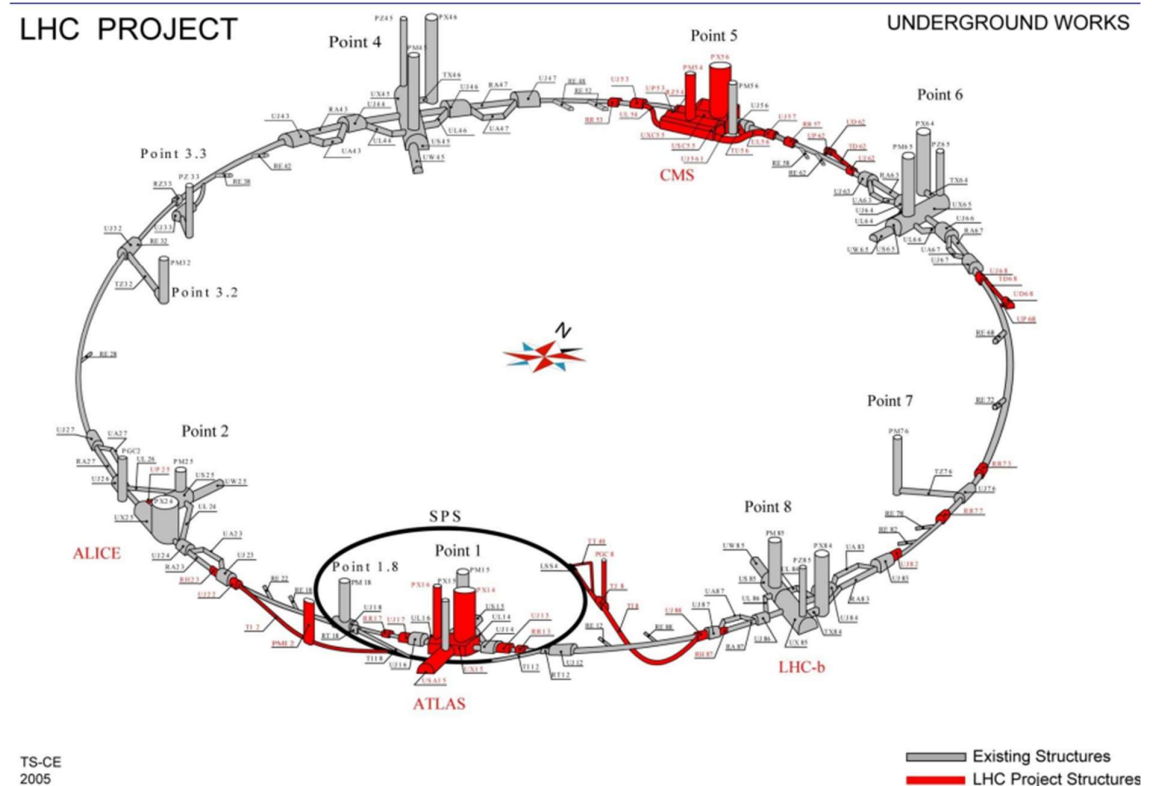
4 Underground map of the LHC and SPS tunnel and location of tunnel points (Large Colliders:Civil Engineering and Siting, n.d.)
